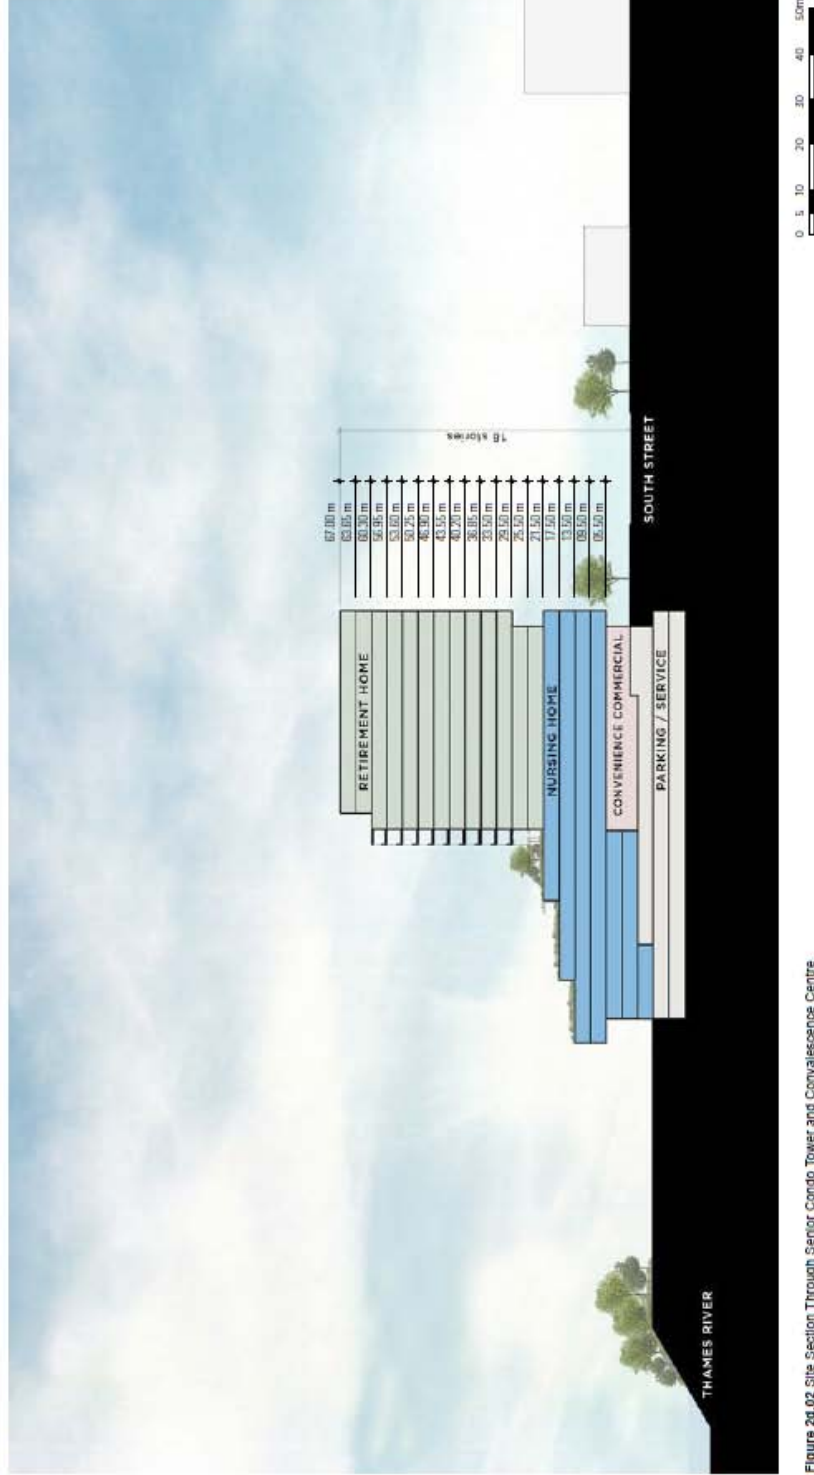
Site Section Through Senior Condo Tower and Convalescence Centre
